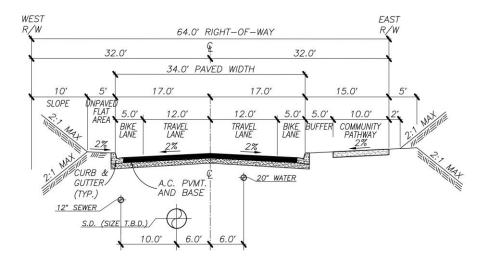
Street Section 10B – Proctor Valley Road Modified 2-Lane Light
